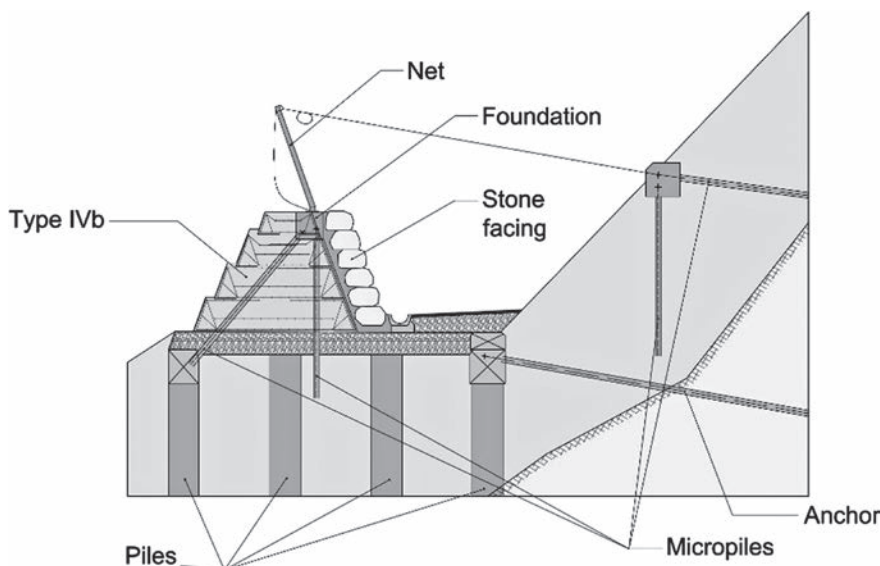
Example of a dam with combined protection and foundation measures with longitudinal reinforcement according to type IVb.
